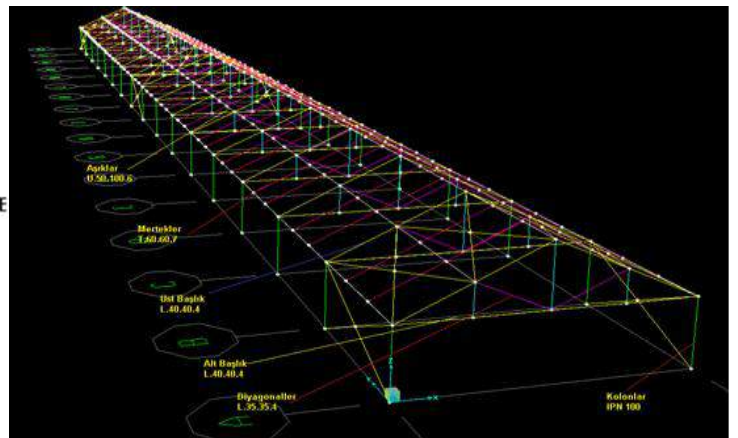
Greenhouse Plan AutoCAD Drawing (3D)
